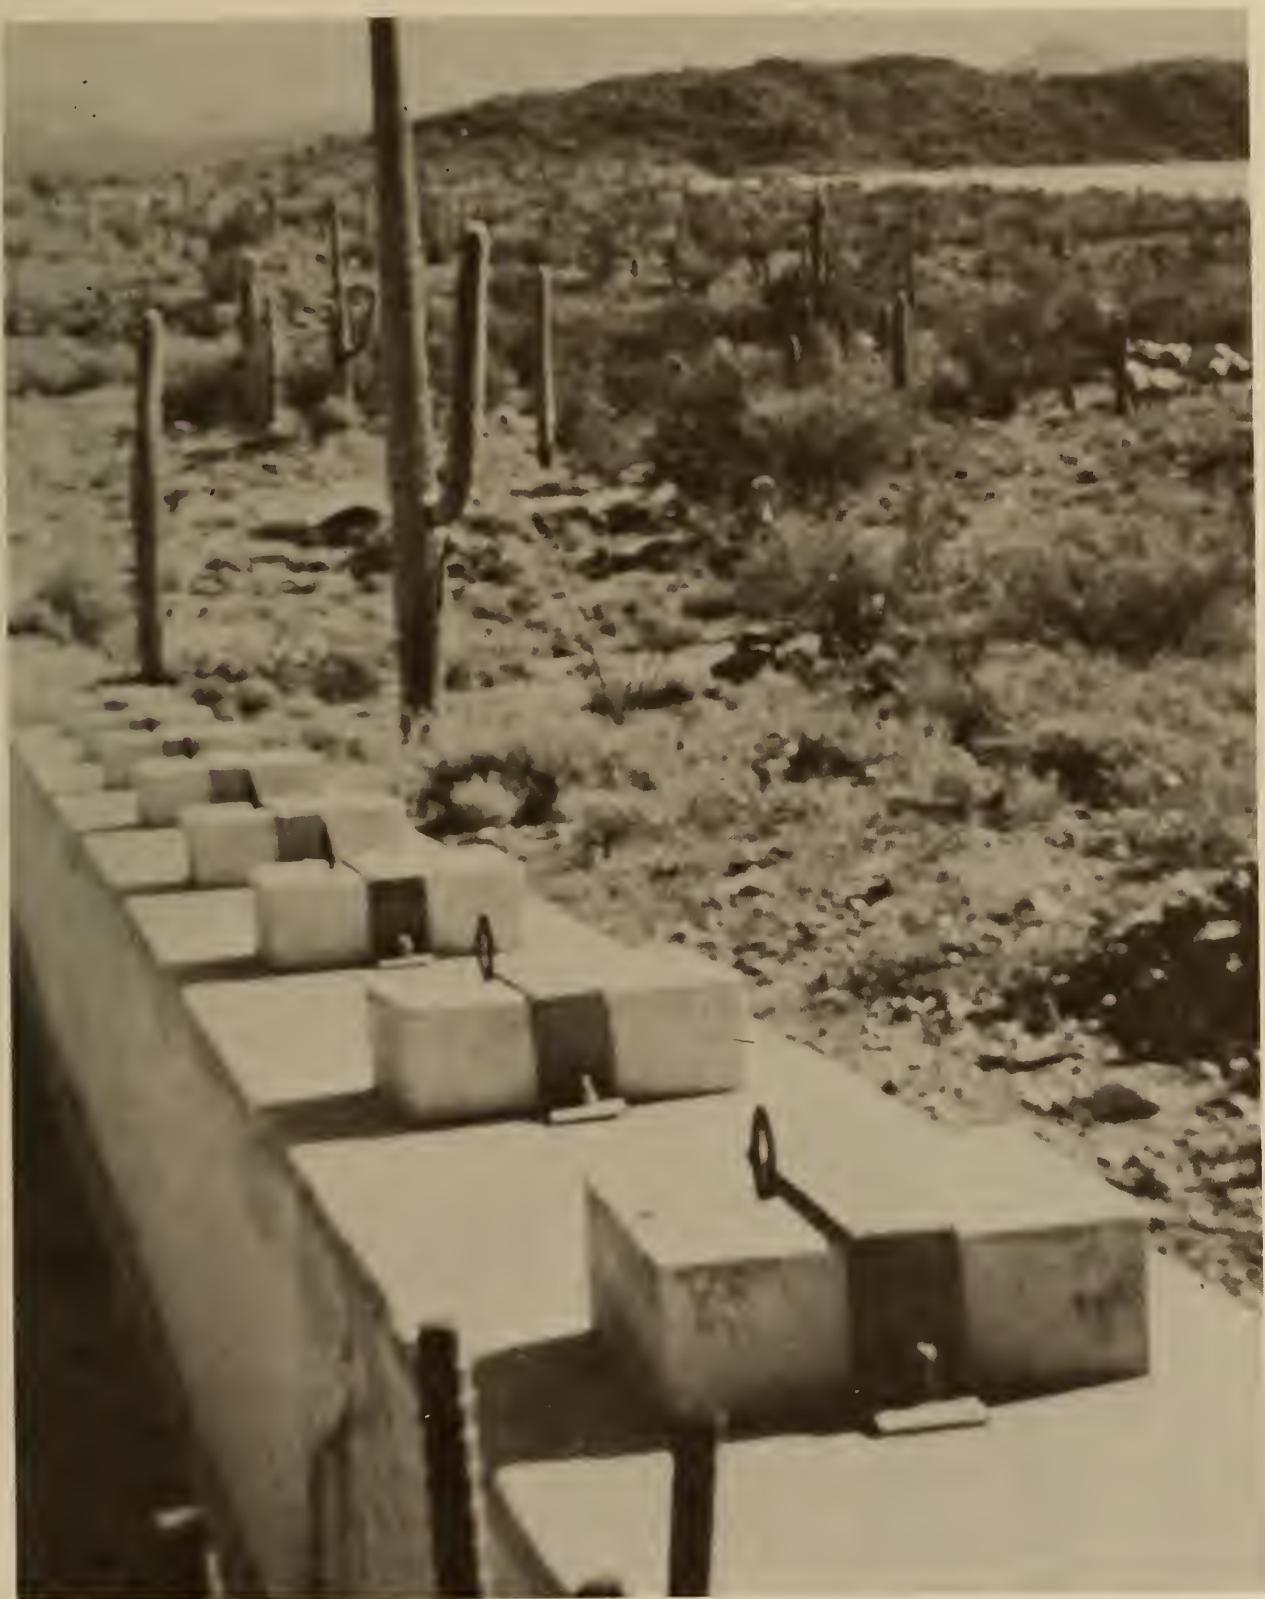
Decant line to tower 6-inch outlets at each 6-inch elevation rise.
